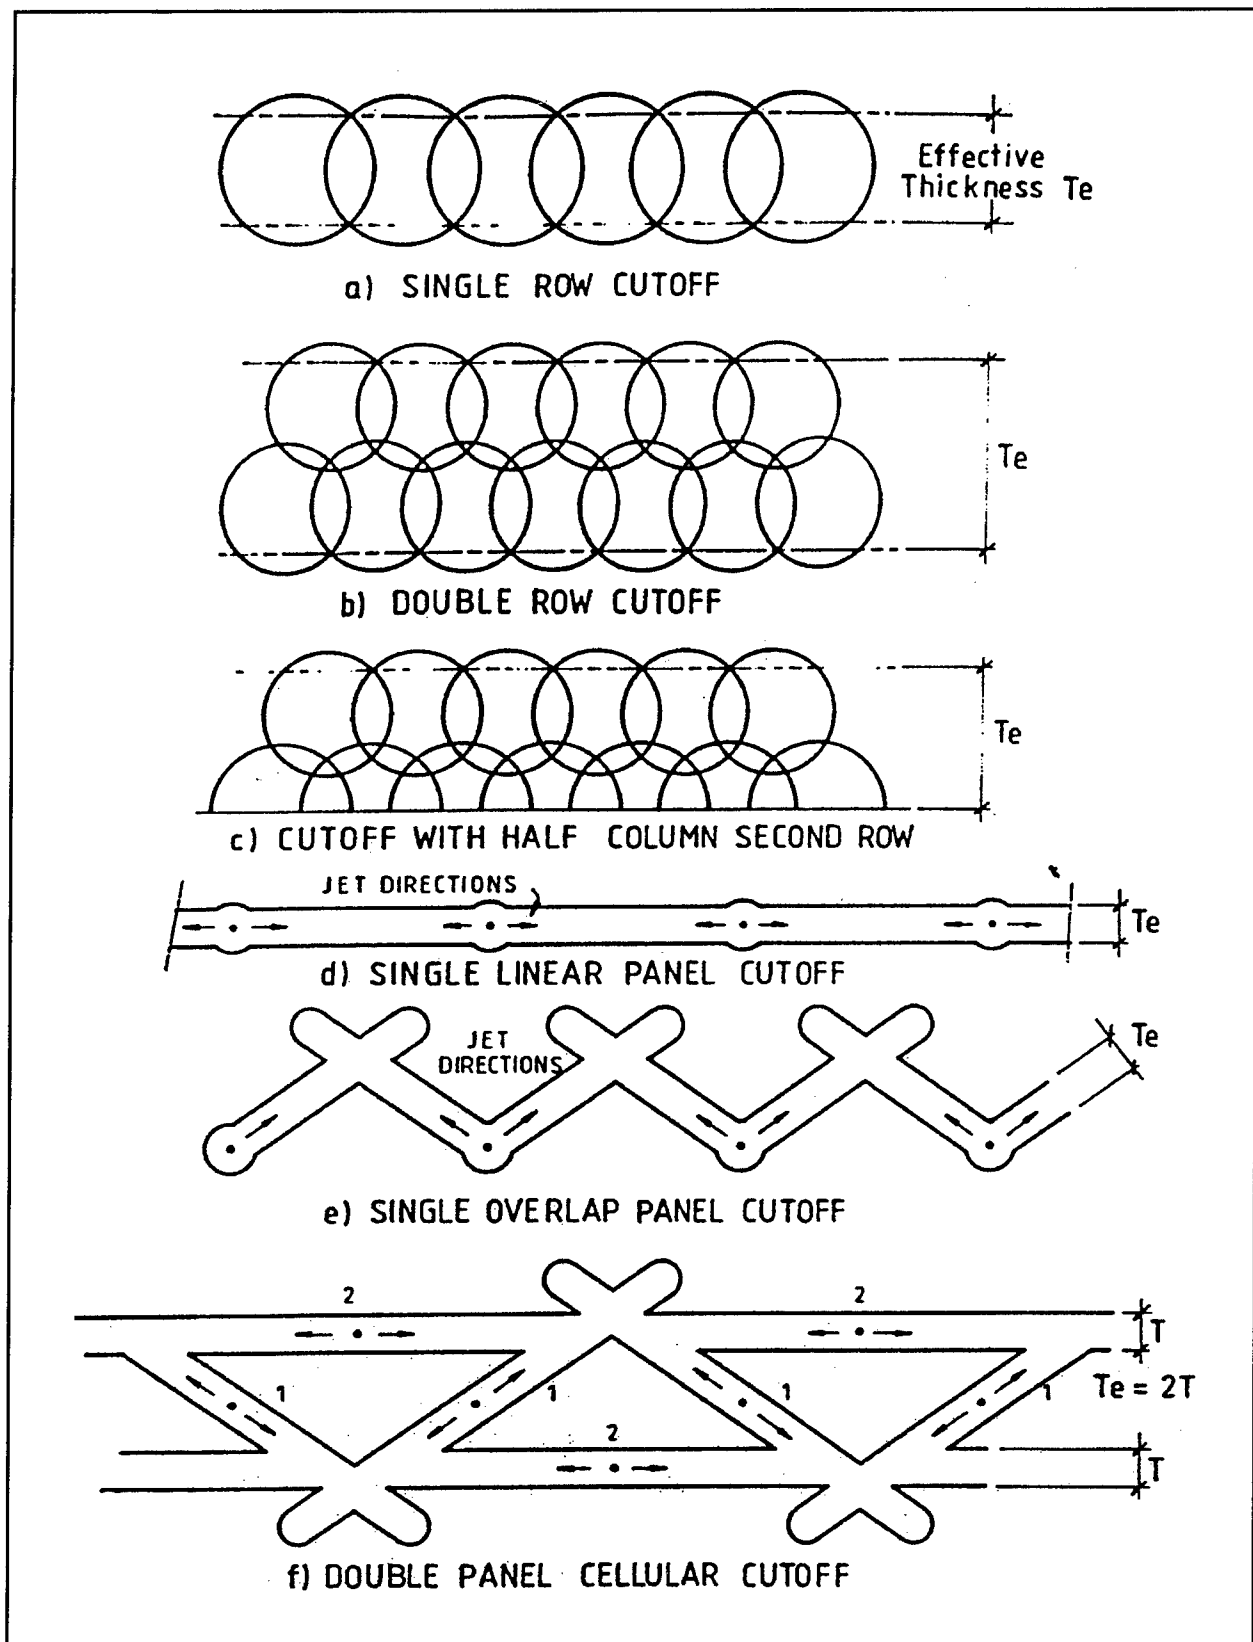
Typical columns and panel layouts for jet grouted cutoffs (courtesy of Bell 1993)
